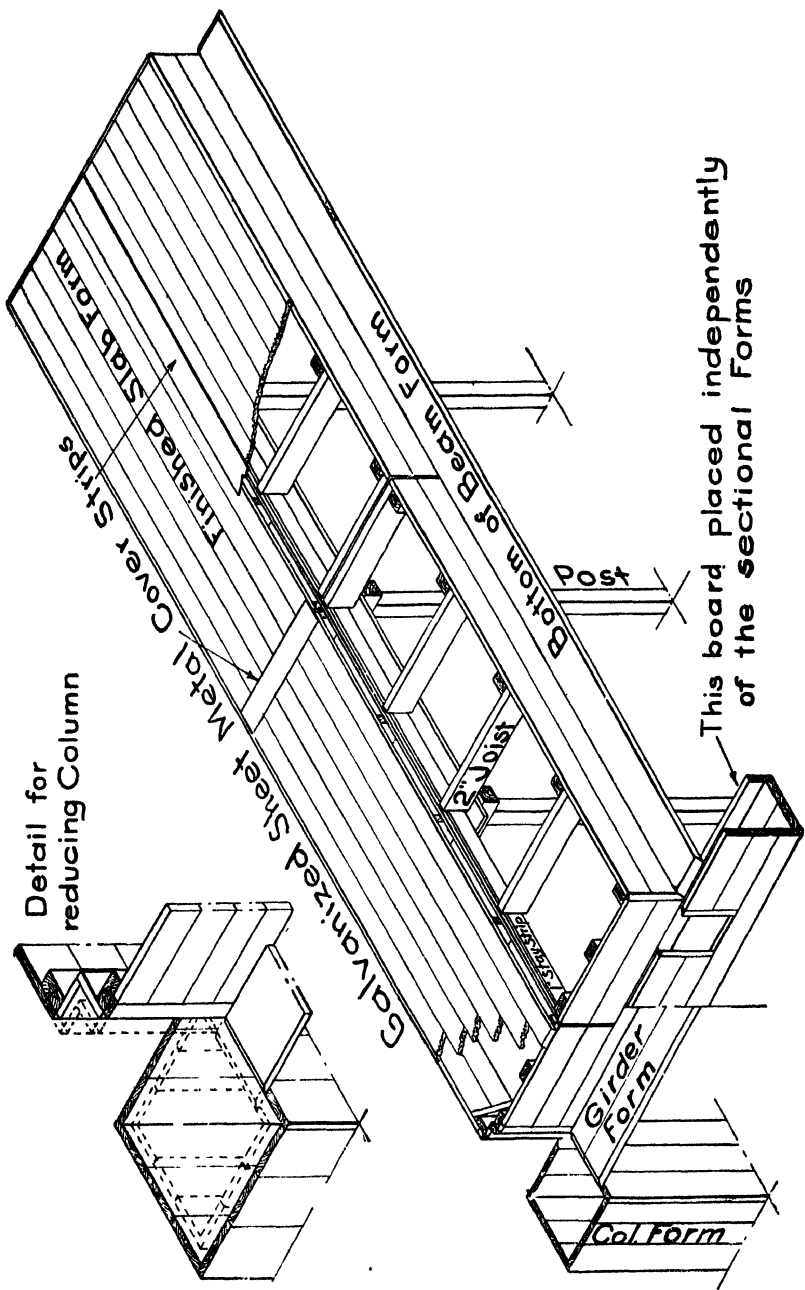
Forms for Flat Slab Construction Using Joists and Stringers. (See p. 655.)
